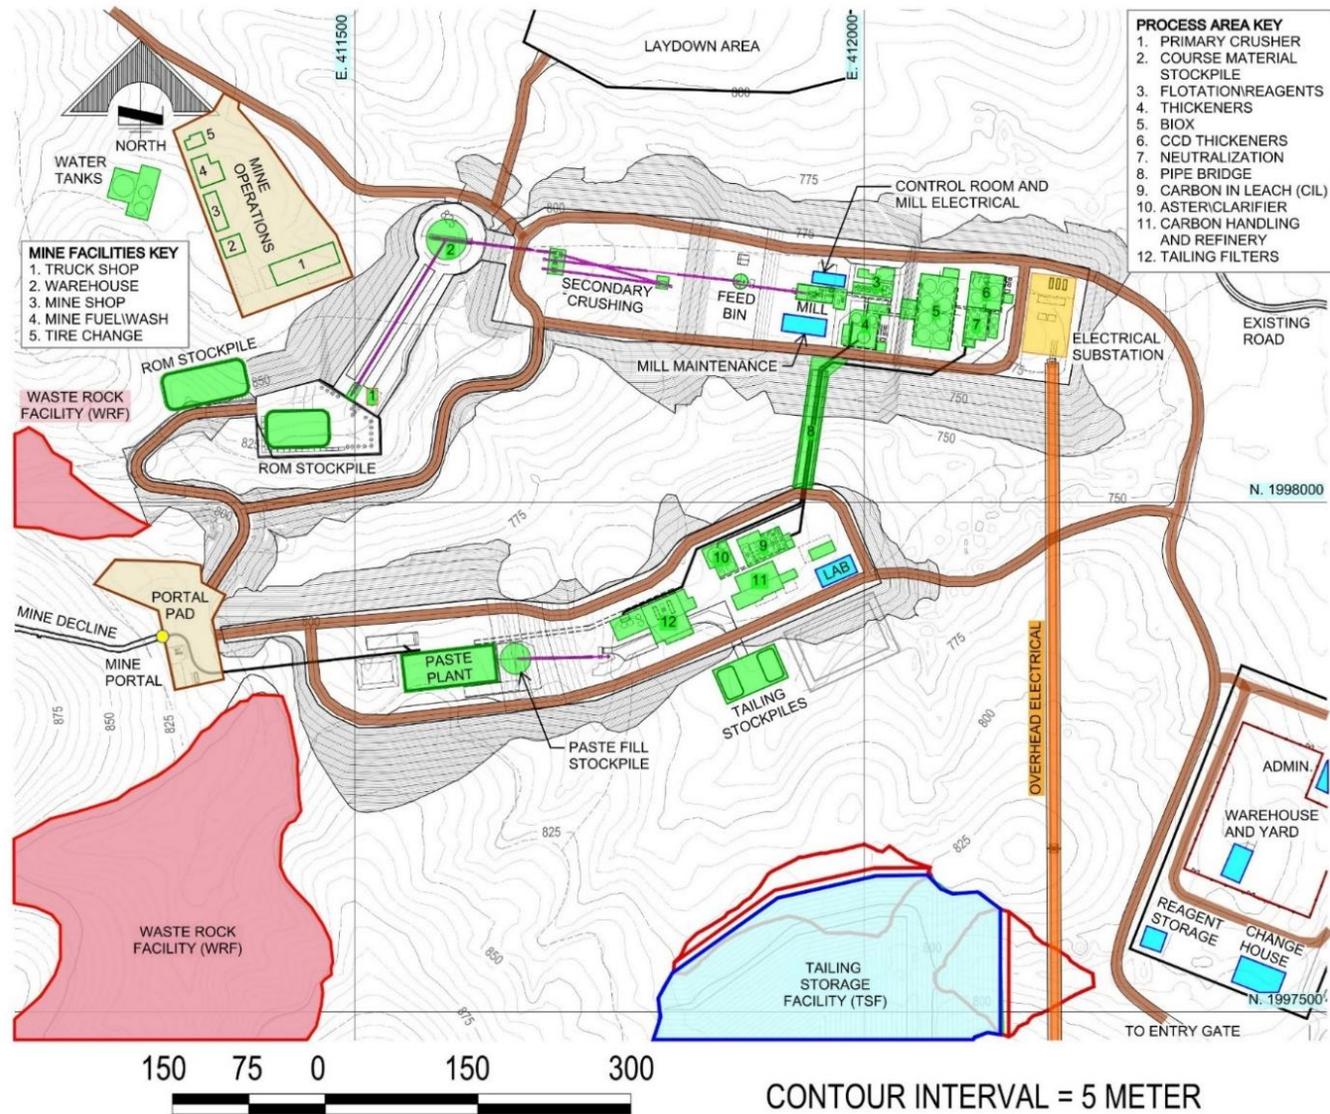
Overall Site Plan with WRF and TSF Shown
